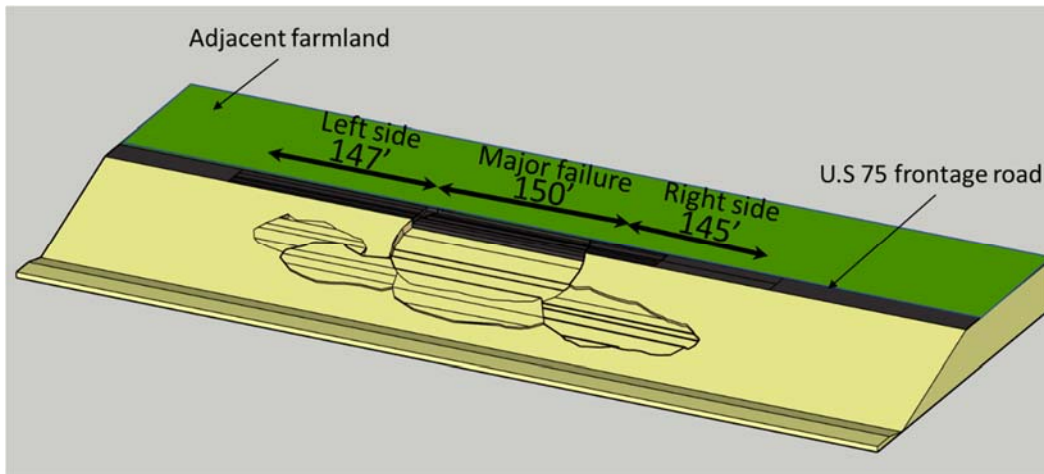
Schematic of failed slope of U.S. 75 Frontage Road
